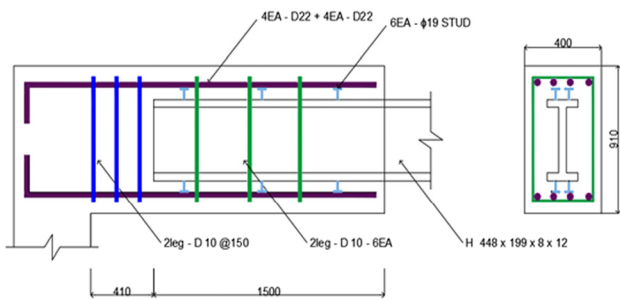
HI-BEAM Y1 Column Structure Drawing
